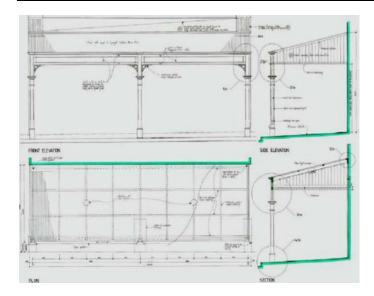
Construction of three-post timber awning to late-nineteenth century configuration, 139–141 George Street, 1983. Source: PMNSW Drawing HP9/19.
